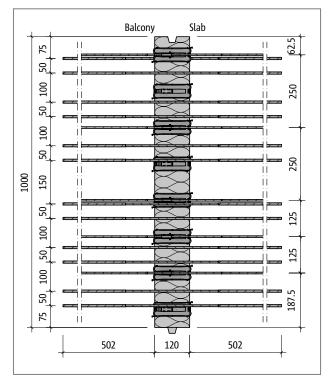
Schöck Isokorb® XT type K-M4: Product plan view
